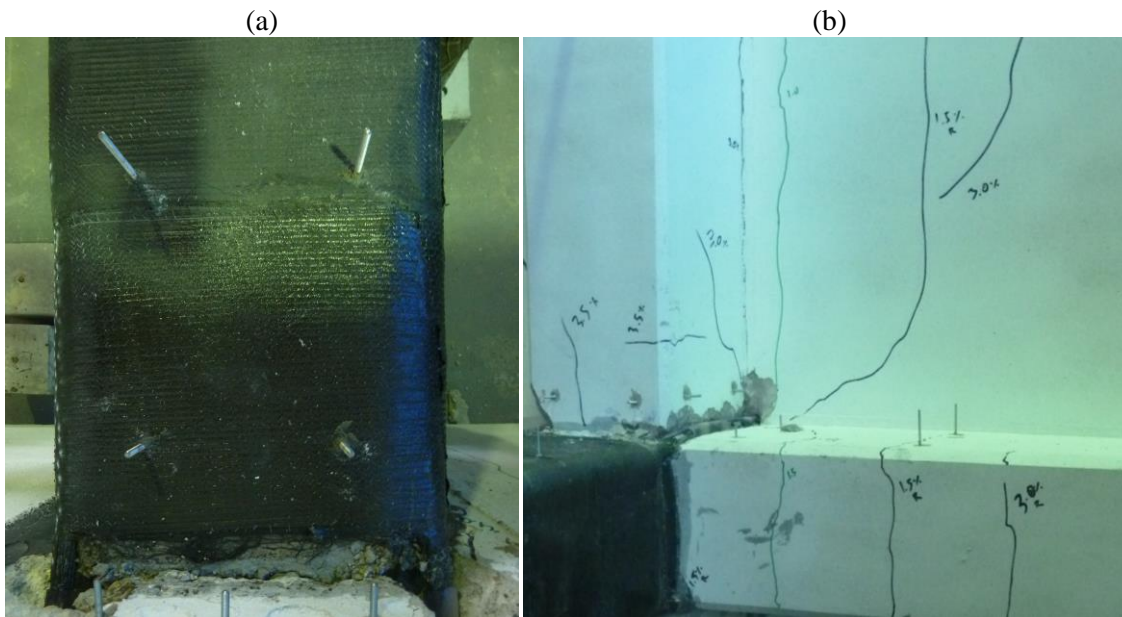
Final damage in specimen C2-RP-A: (a) large crack at superior column/joint interface; (b) cracks in bottom of beam and slab.
